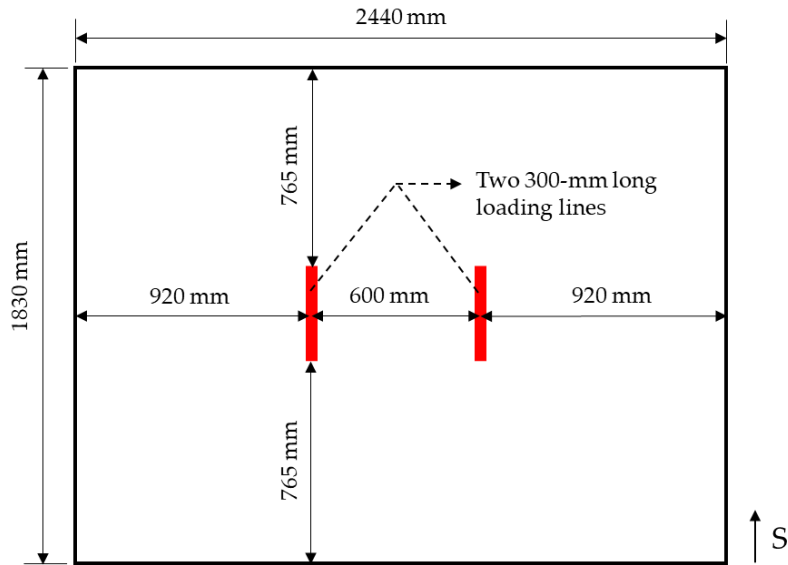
Plan view of the top surface of a slab specimen and the loading lines
